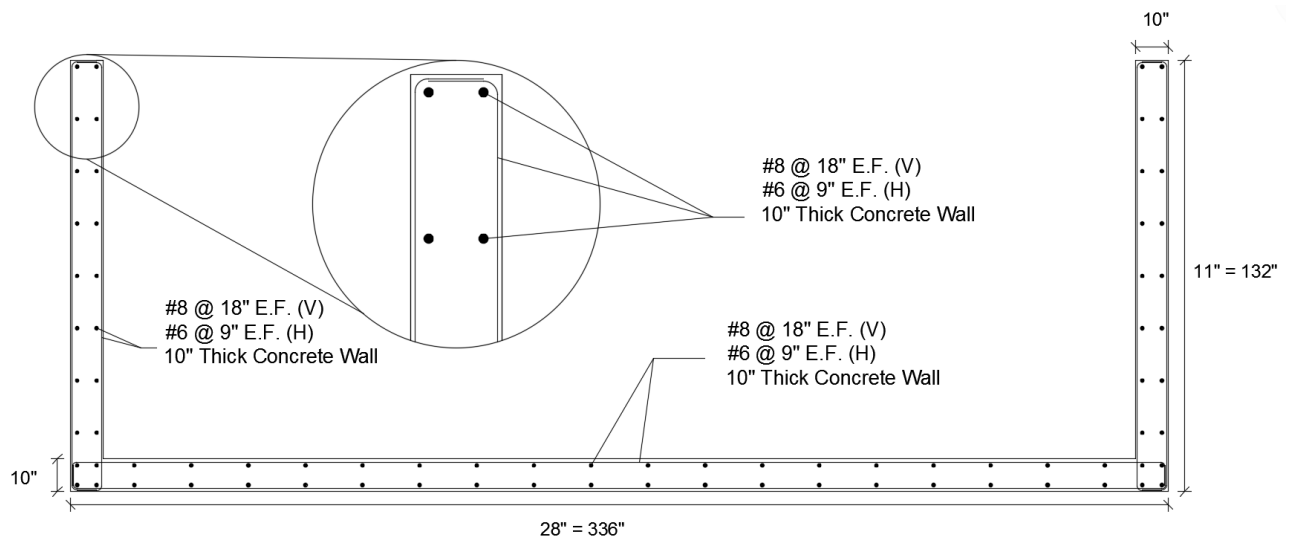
Original Elevator/ Mech. Room shear wall cross-section at the ground floor level
